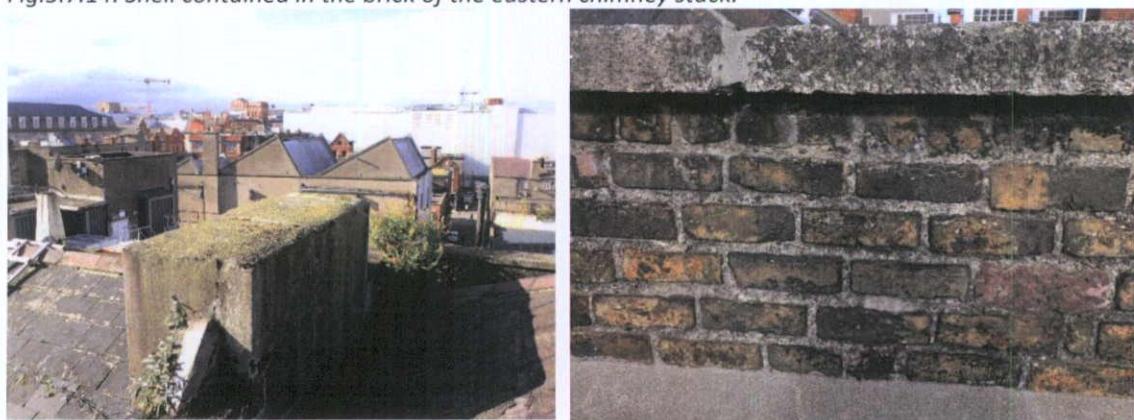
The cut-down Chimney B on the west side of the roof (left) and the granite-capped stock brick wall linking the two chimneys (right).
